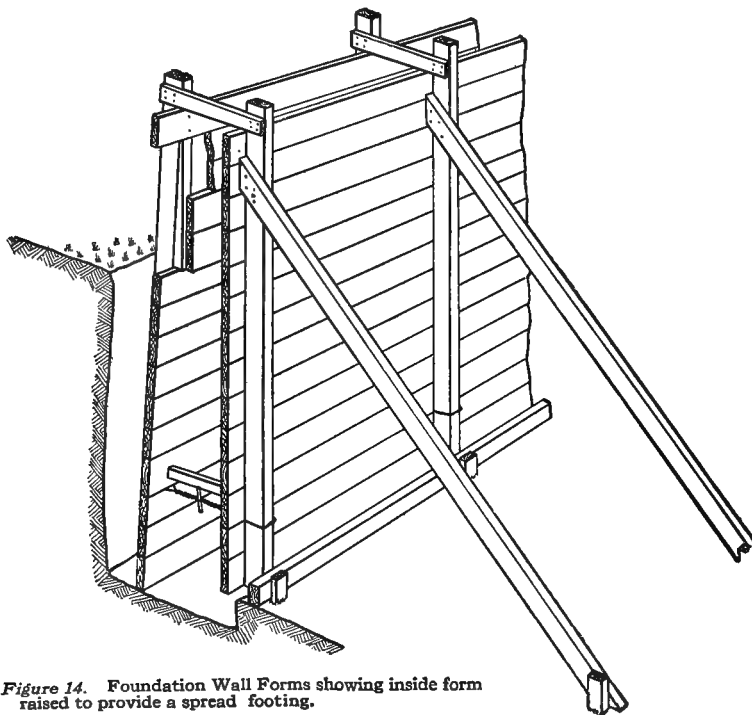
Foundation Wall Forms showing inside form raised to provide a spread footing.
